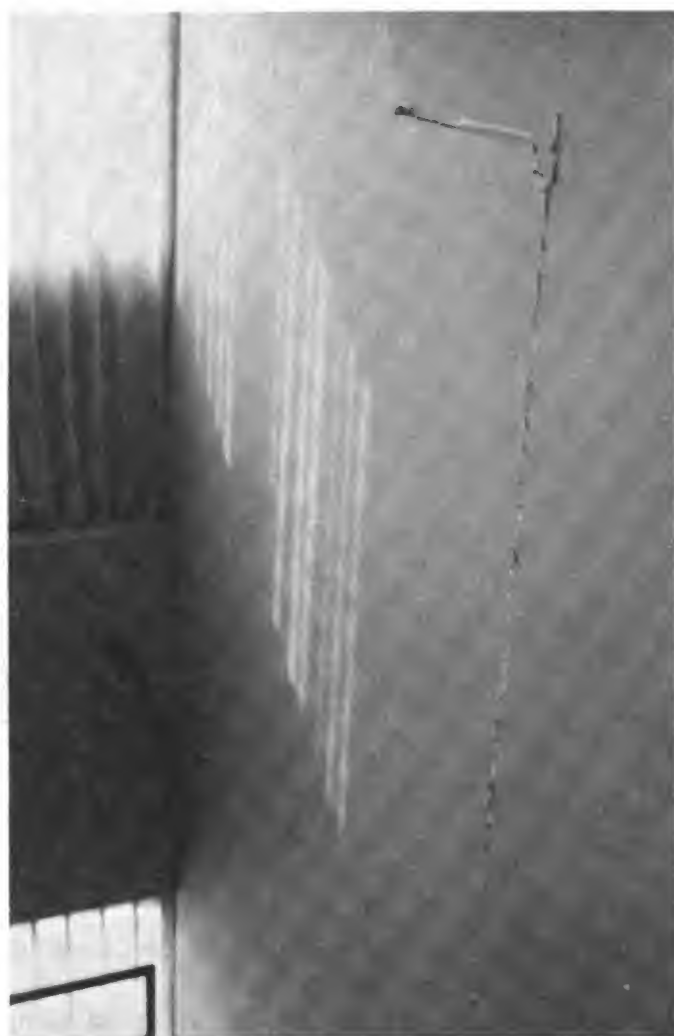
Bank of California. Side walls of northwest stairwell showed signs of "working" during the earthquake. Brandow & Johnston photograph.
